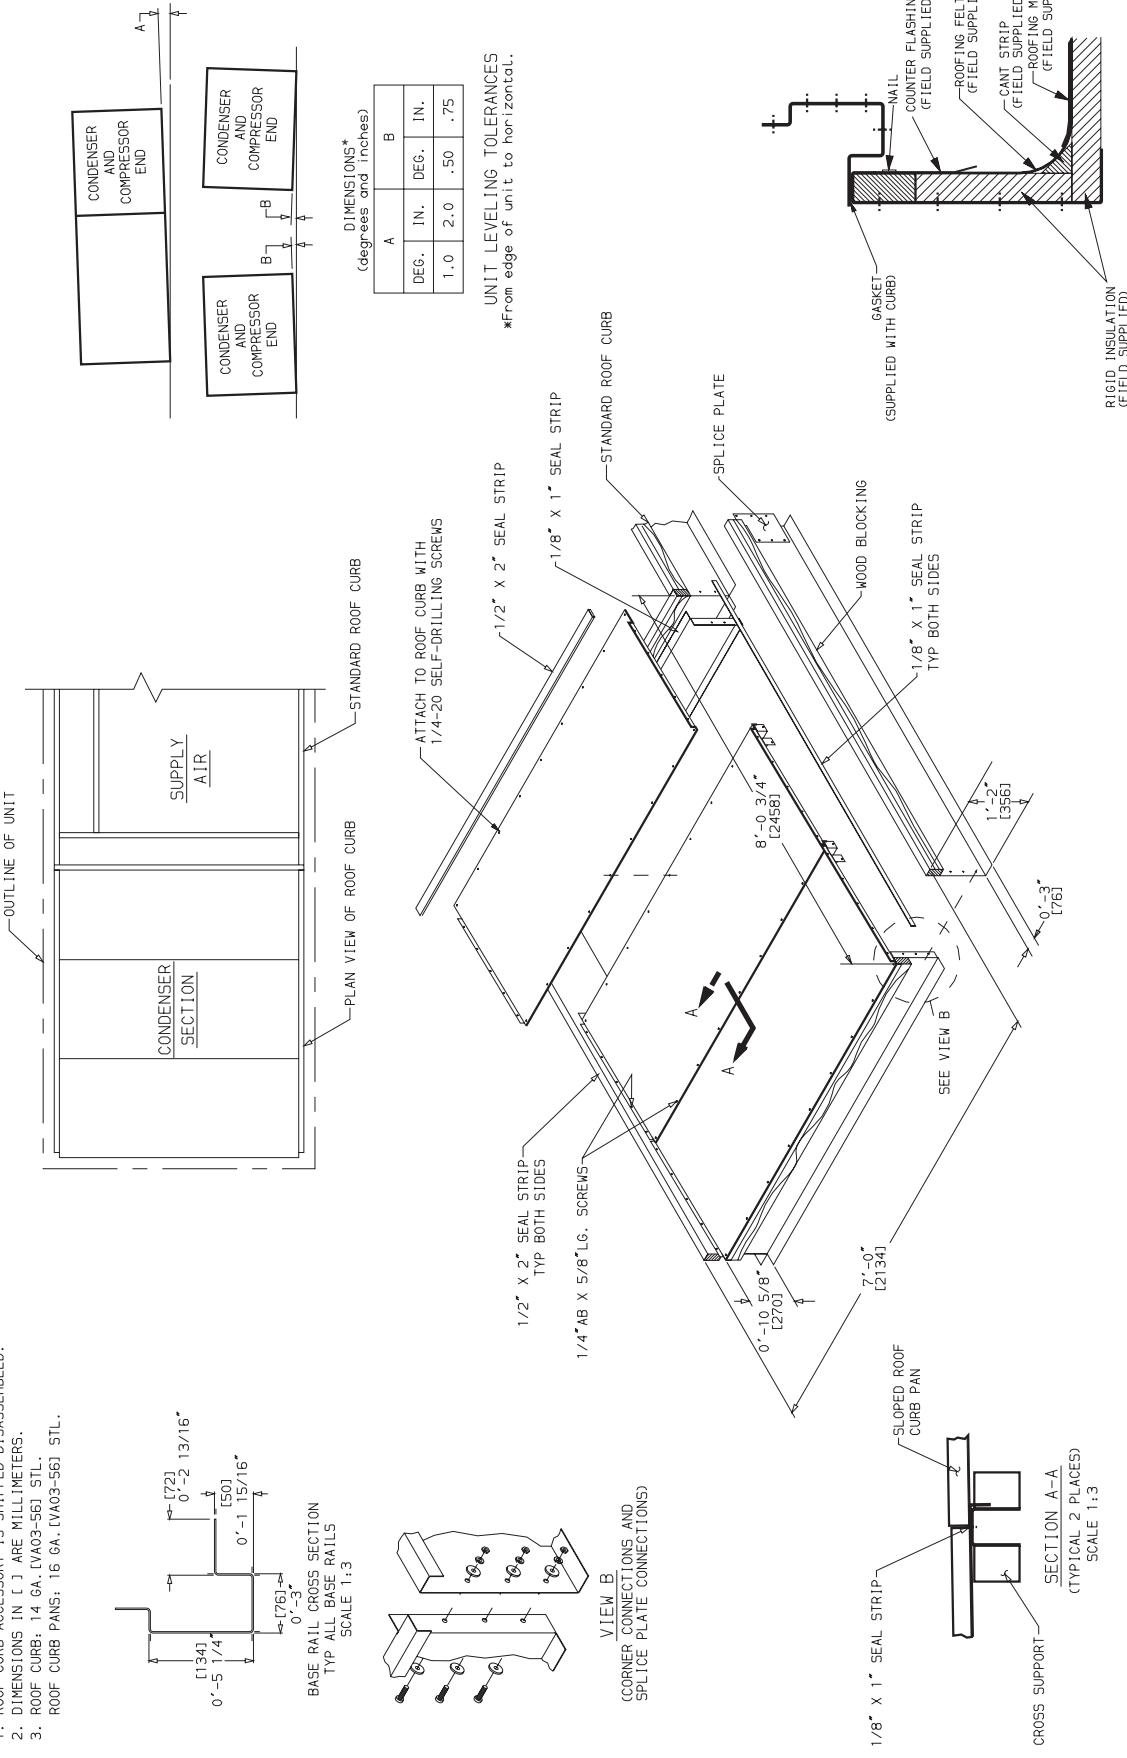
Condenser Section Roof Curb (Size 055 and 060 Only)
